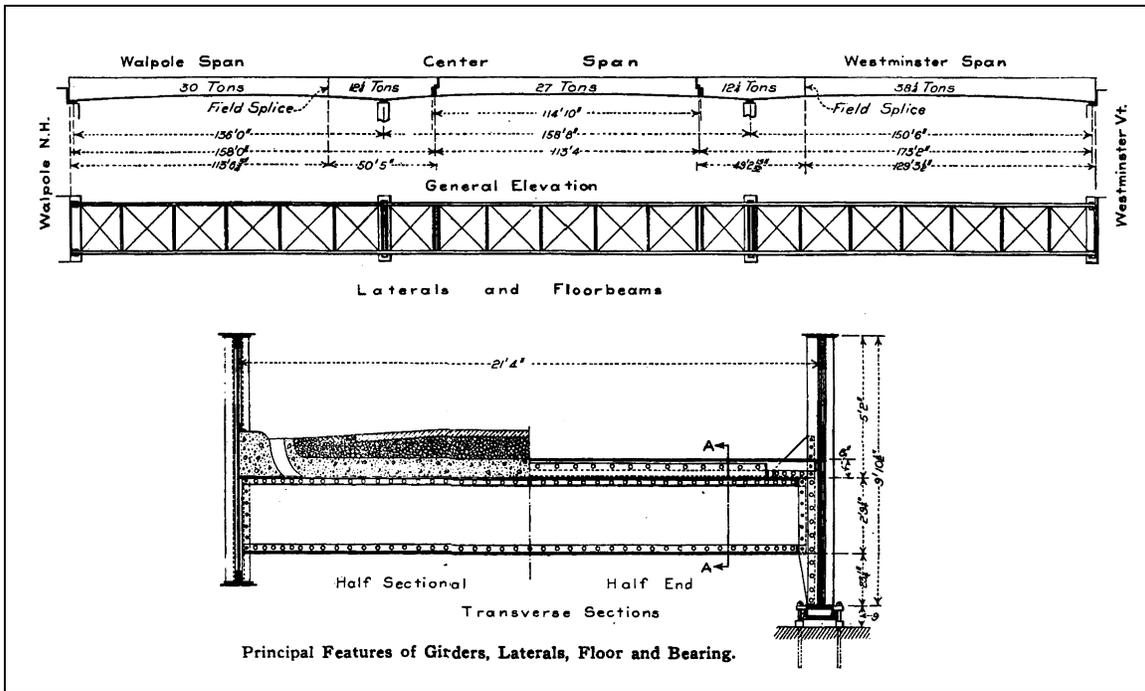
Elevation, plan & section drawings of Walpole Village Bridge (1910); the innovative engineering features of the bridge merited an article on the bridge entitled "The Walpole Bridge," in the leading engineering journal of the day (*Engineering News-Record* 1911).
